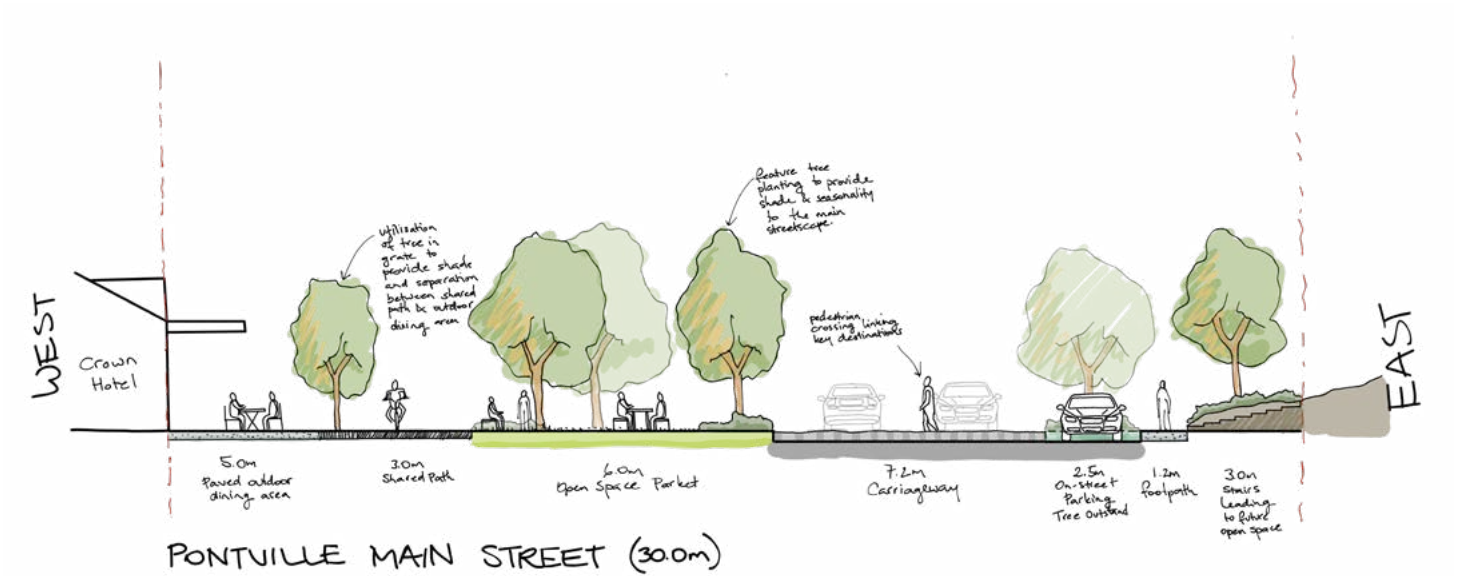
Section E – Pontville – Brighton Road – Town Centre – Main Street
